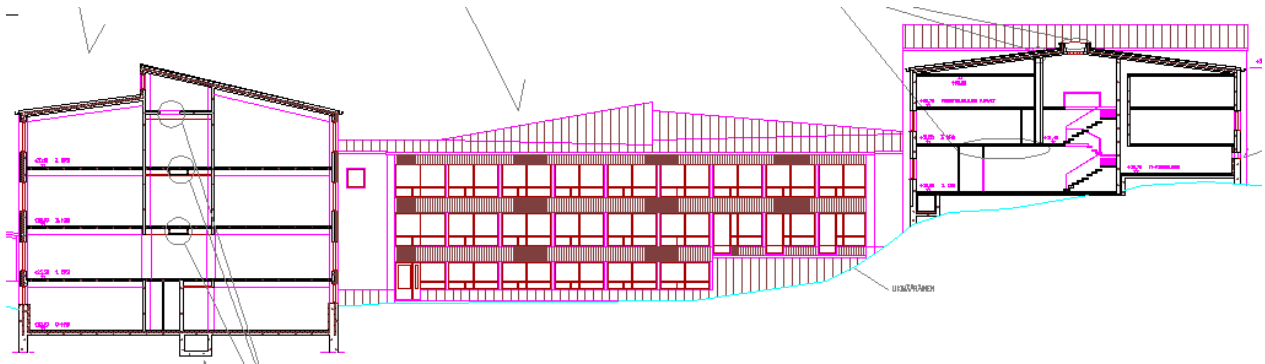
Cross-section of Alppila school building which shows the roof pitch, different floor heights and how the rock slope affects the building shape
